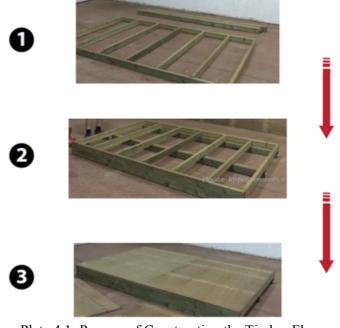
Process of Constructing the Timber Floor Source: [20].
